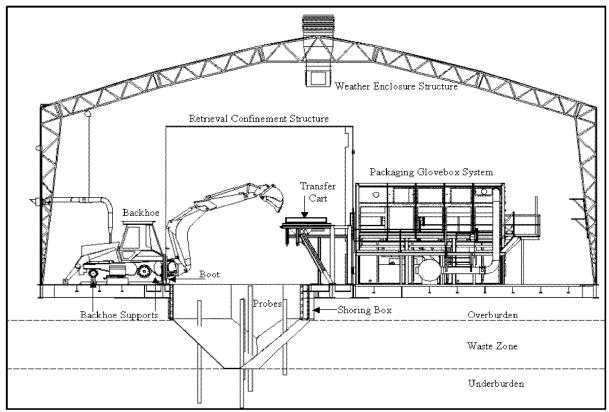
Cross section of the OU 7-10 Glovebox Excavator Method Project facility.
